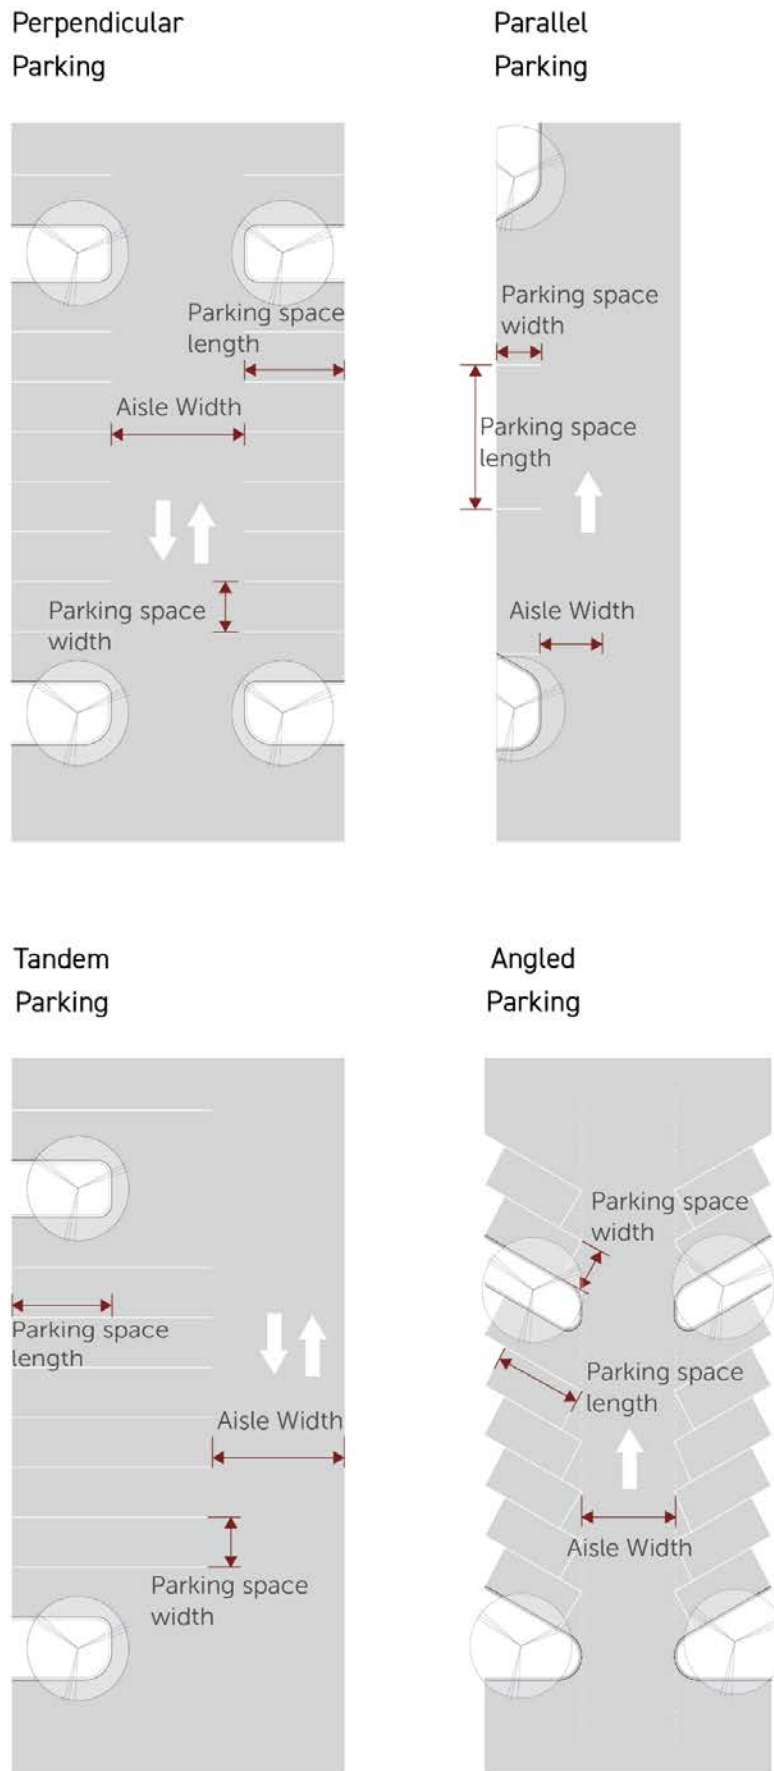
Section 10.6.1 – Automobile Parking Space Provisions
